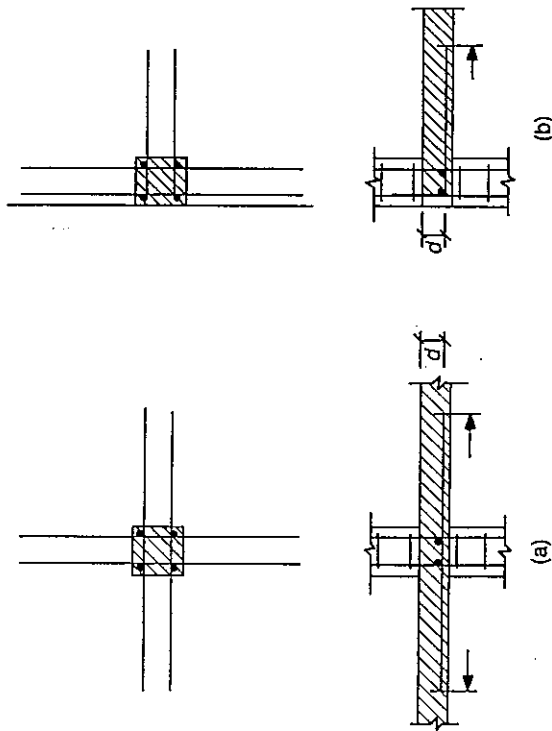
Bottom reinforcement at slab-column interfaces: (a) internal column; (b) edge column
